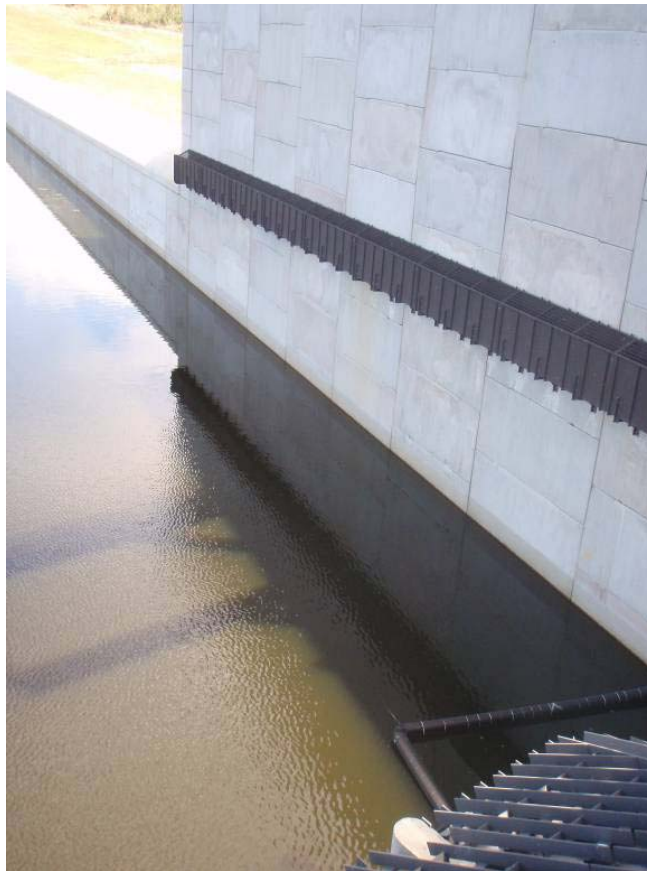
Passage or “flume” joining to the inlet chamber of the downstream fishway (J Tait, December 2008)
